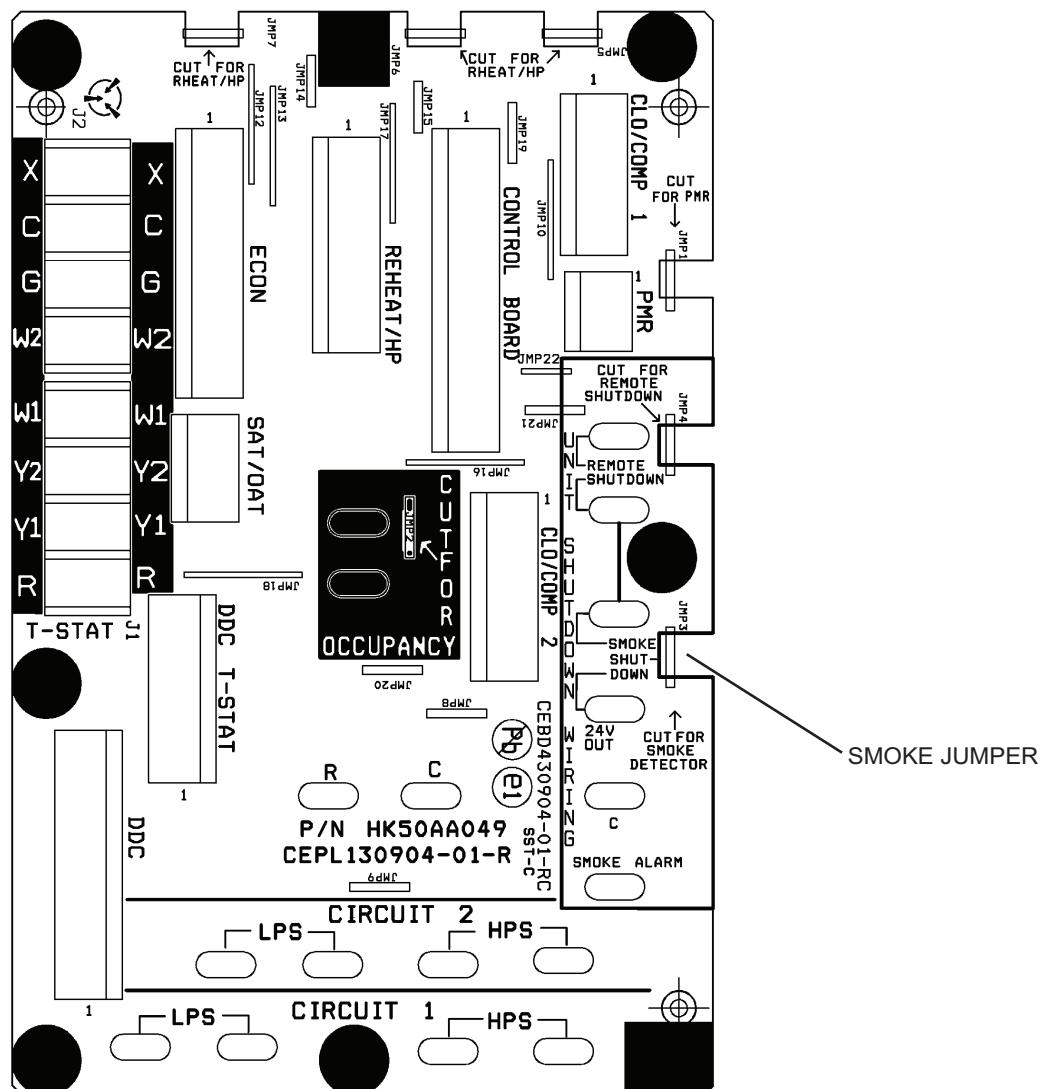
Central Terminal Board (Not Used for 48/50LC Models)
